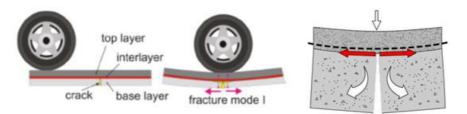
The process of crack development under wheel loading. Model of cracking caused by bending mechanism
